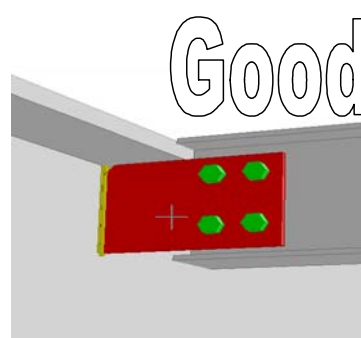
Beam to beam joint of open sections, simple connection in global analyses; successful case with long fin plate; beam HE 1000A, secondary beam IPE 240; bolts 4xM16
